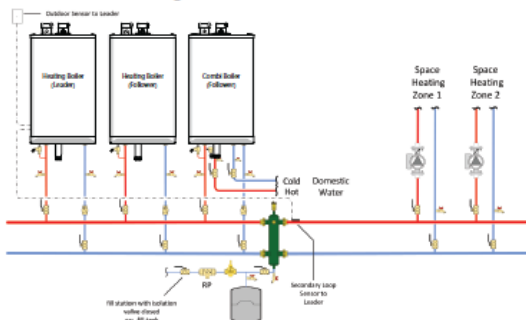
Typical Heating Boiler cascade piping – concept drawing. This drawing is only a simple schematic guide
